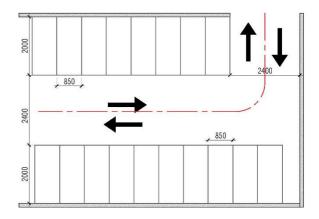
Minimum dimensions for parallel motorbike parking one-way
